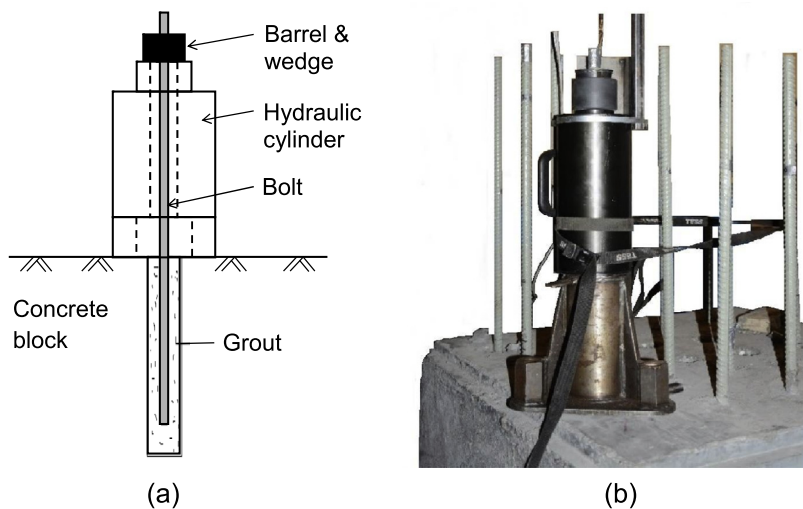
Pull test arrangement. (a) A sketch and (b) the test arrangement.
